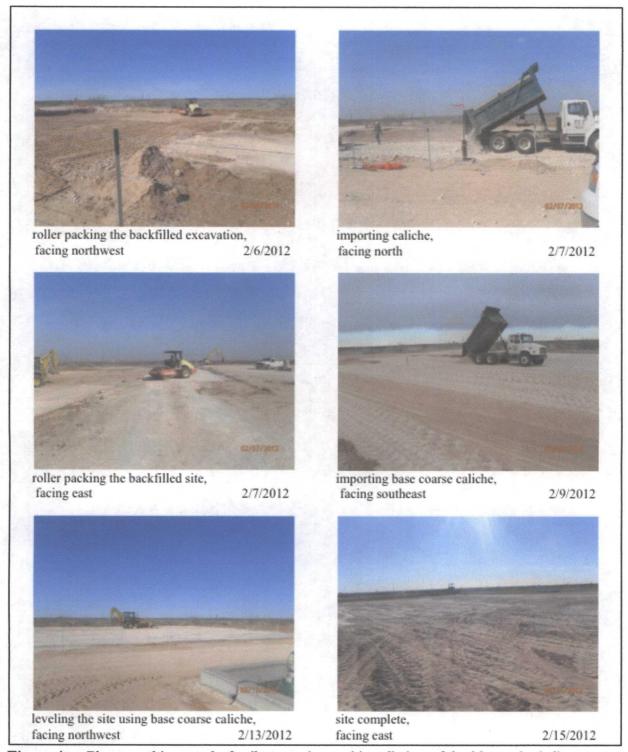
Photographic record of soil excavation and installation of double synthetic liner system.
